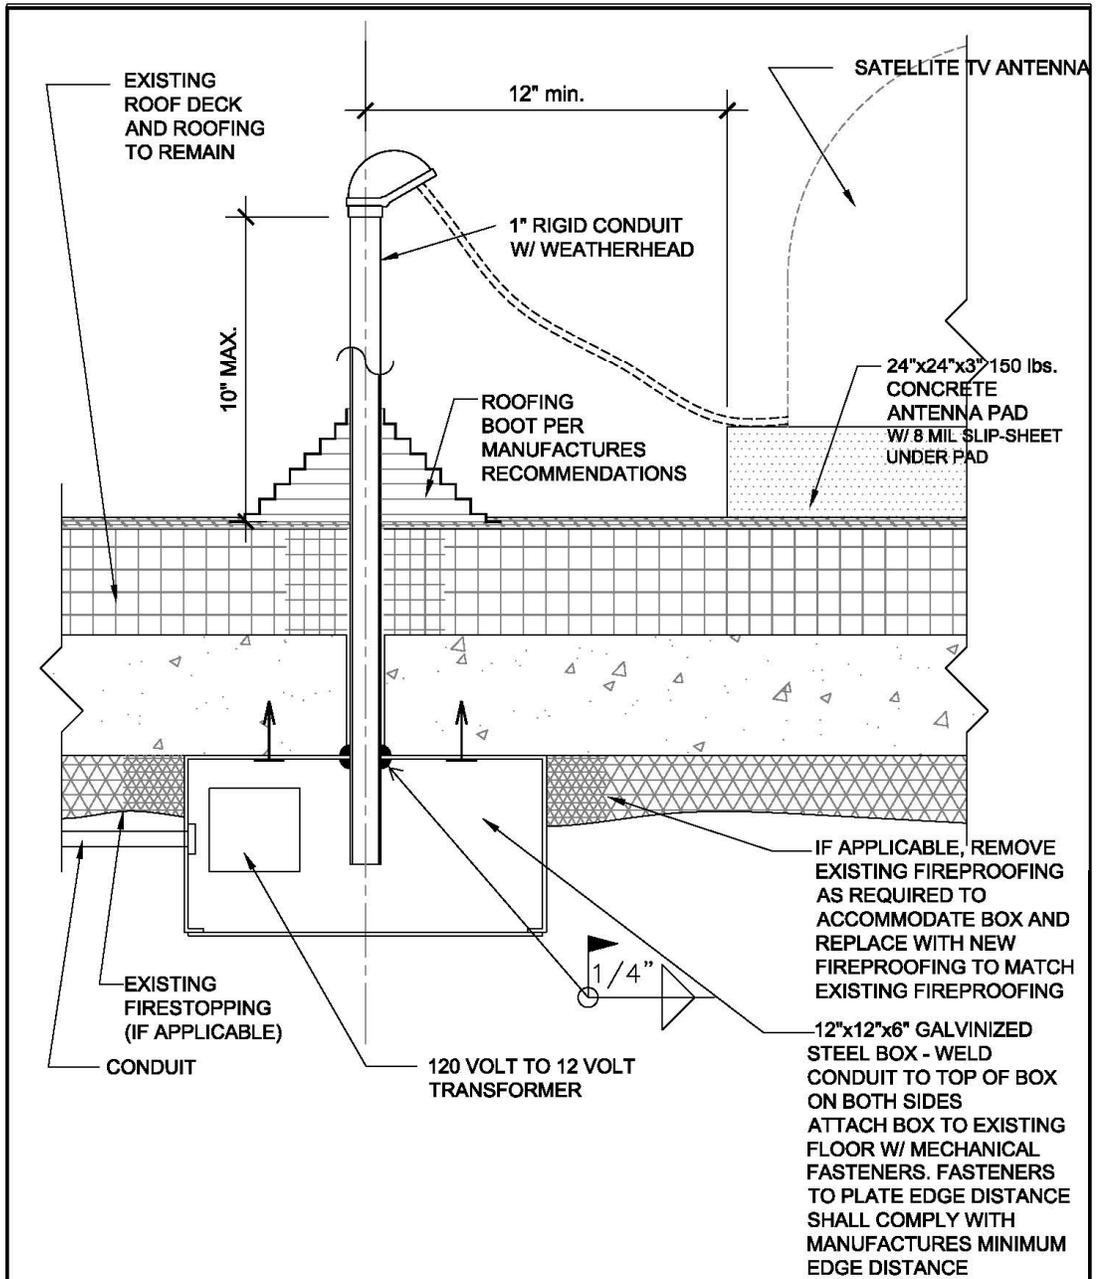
Pipe Thru Roofing System Over Conc. Slab
